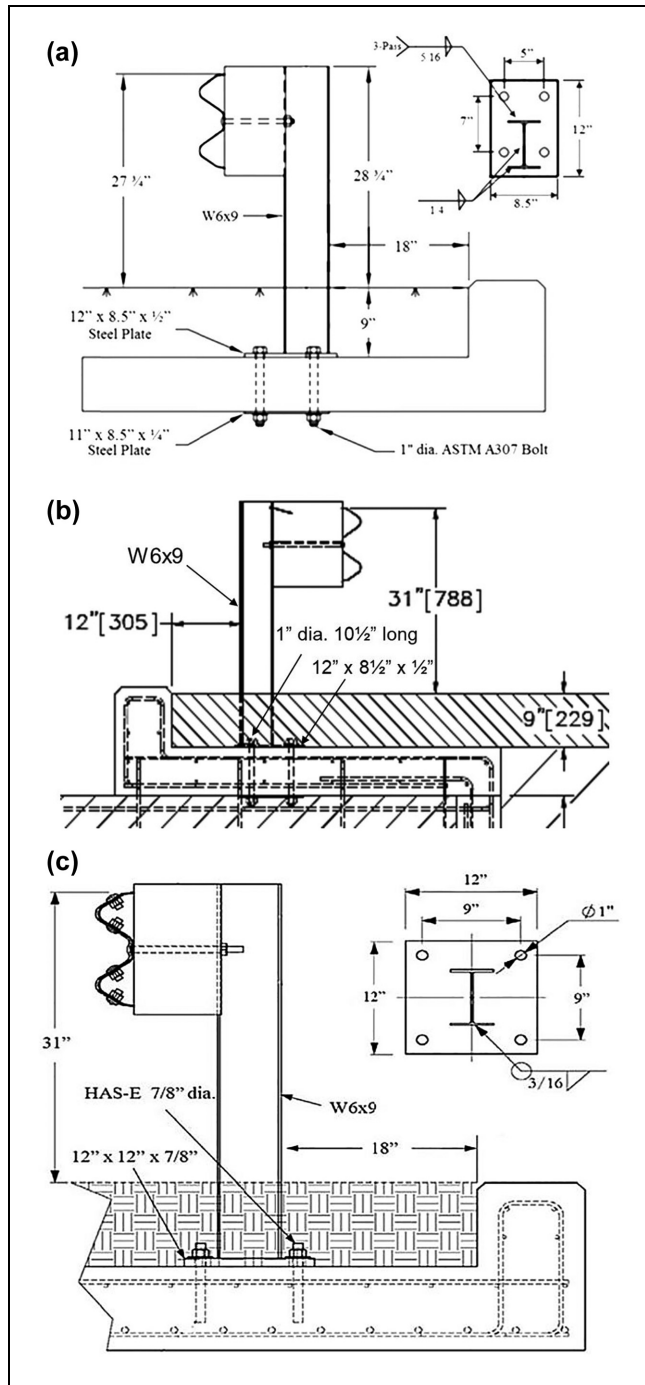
(a) NCHRP Report 350-compliant, G4(1S) guardrail attachment to low-fill culvert (5–7), (b) MASH-compliant, culvert-mounted, Midwest Guardrail System (MGS) developed at MwRSF (9), and (c) MASH-compliant, MGS developed at TTI (10).
